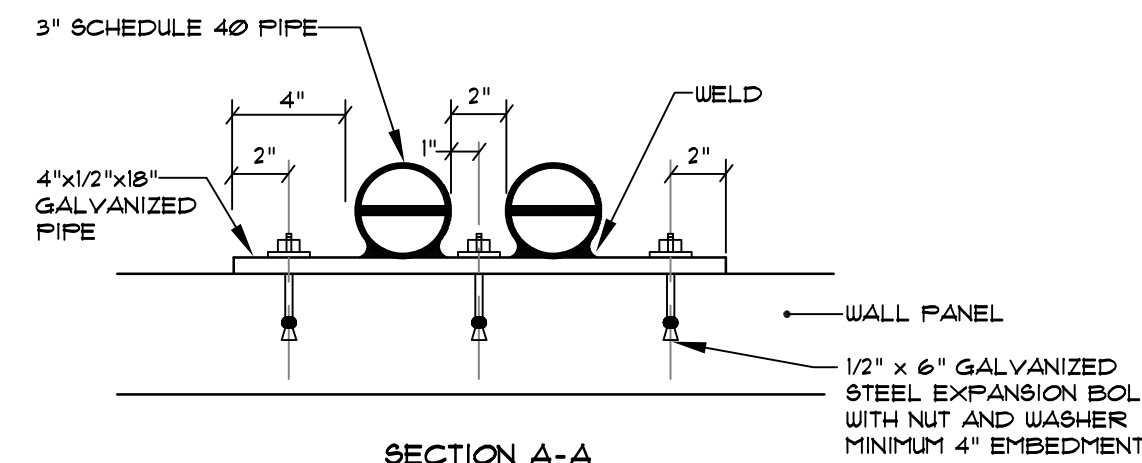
DETAIL ELEVATION OF RAIL MOUNTING BRACKET
